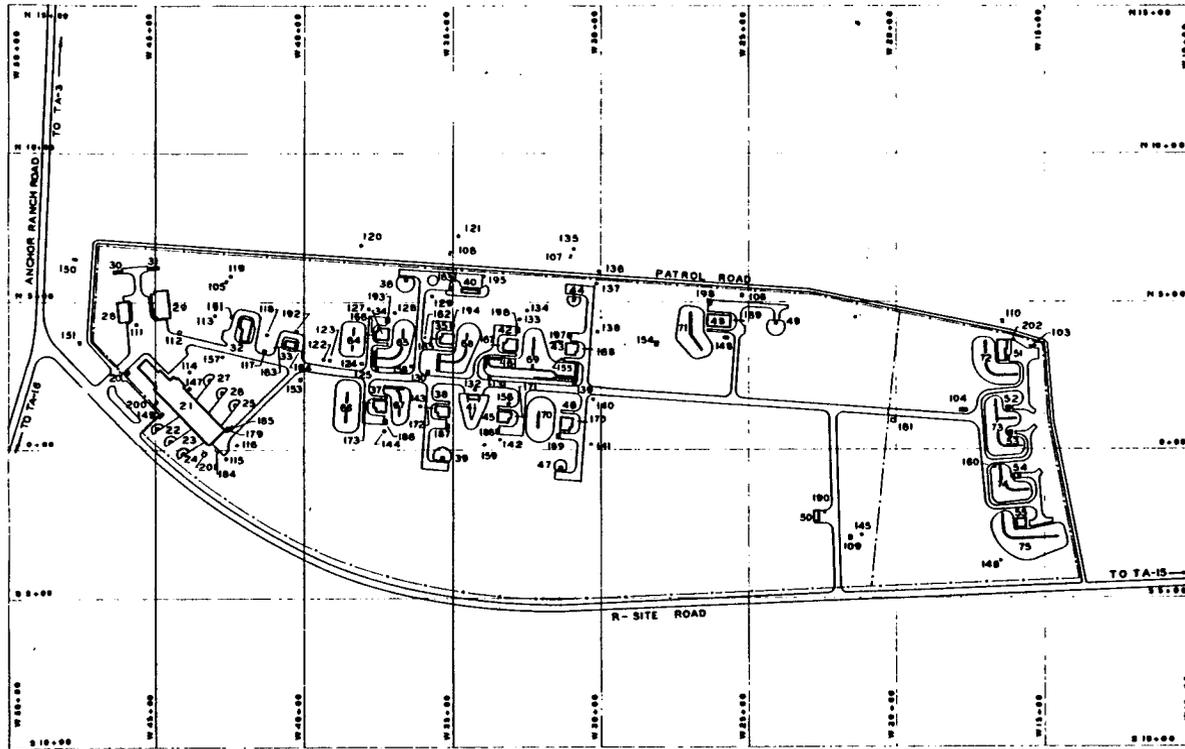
Structure Location Plan for TA-9 - New Site Replacing Anchor East
